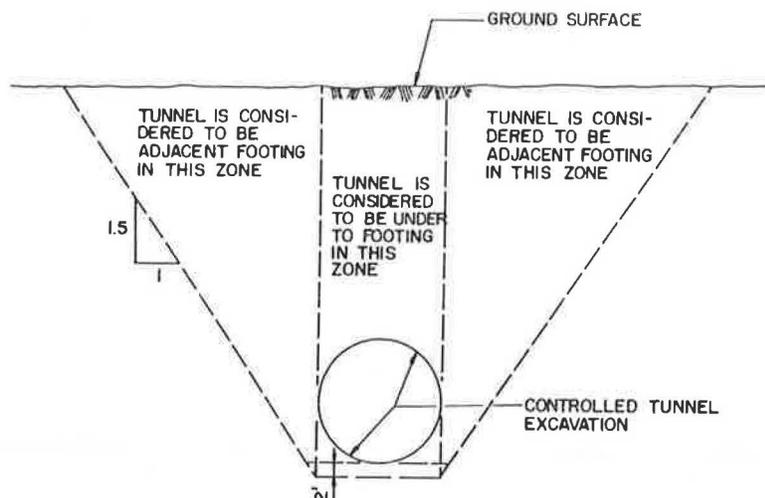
Underpinning guidelines for tunnel construction in soft ground.
